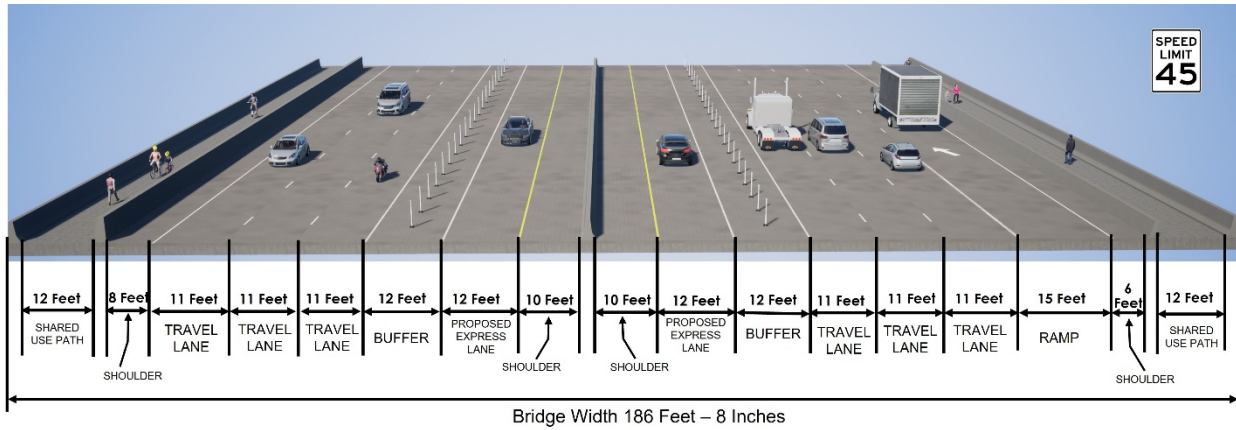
Preferred Alternative US 41 over CSX RR Short Line
